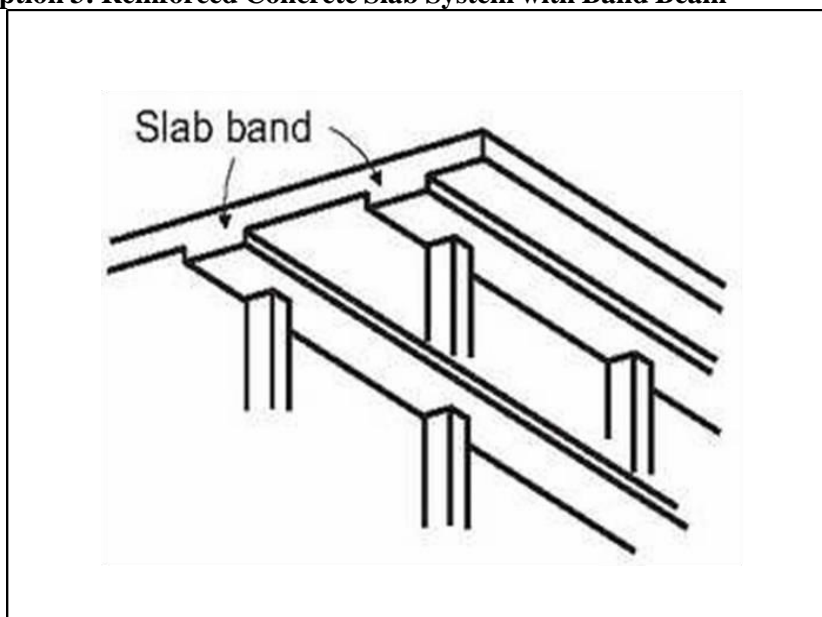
Reinforced Concrete Slab System with Band Beam
